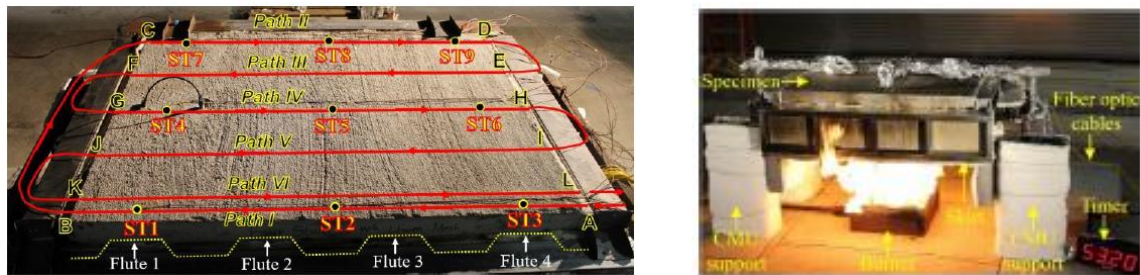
(a) Layout of DTS in the concrete plate, (b) Fibers under temperature load [15]
